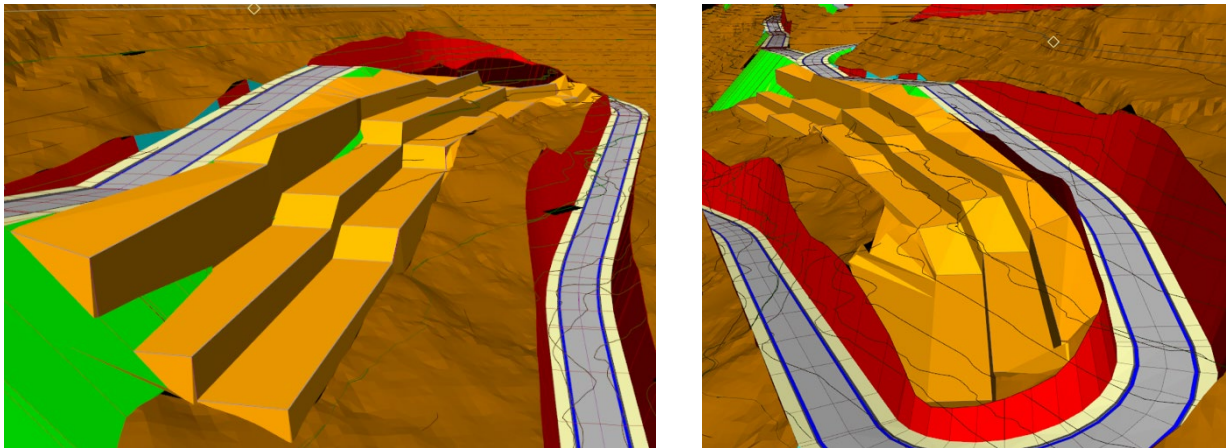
Alpine Chalet foundation benches are planned for Fernhill Heights
